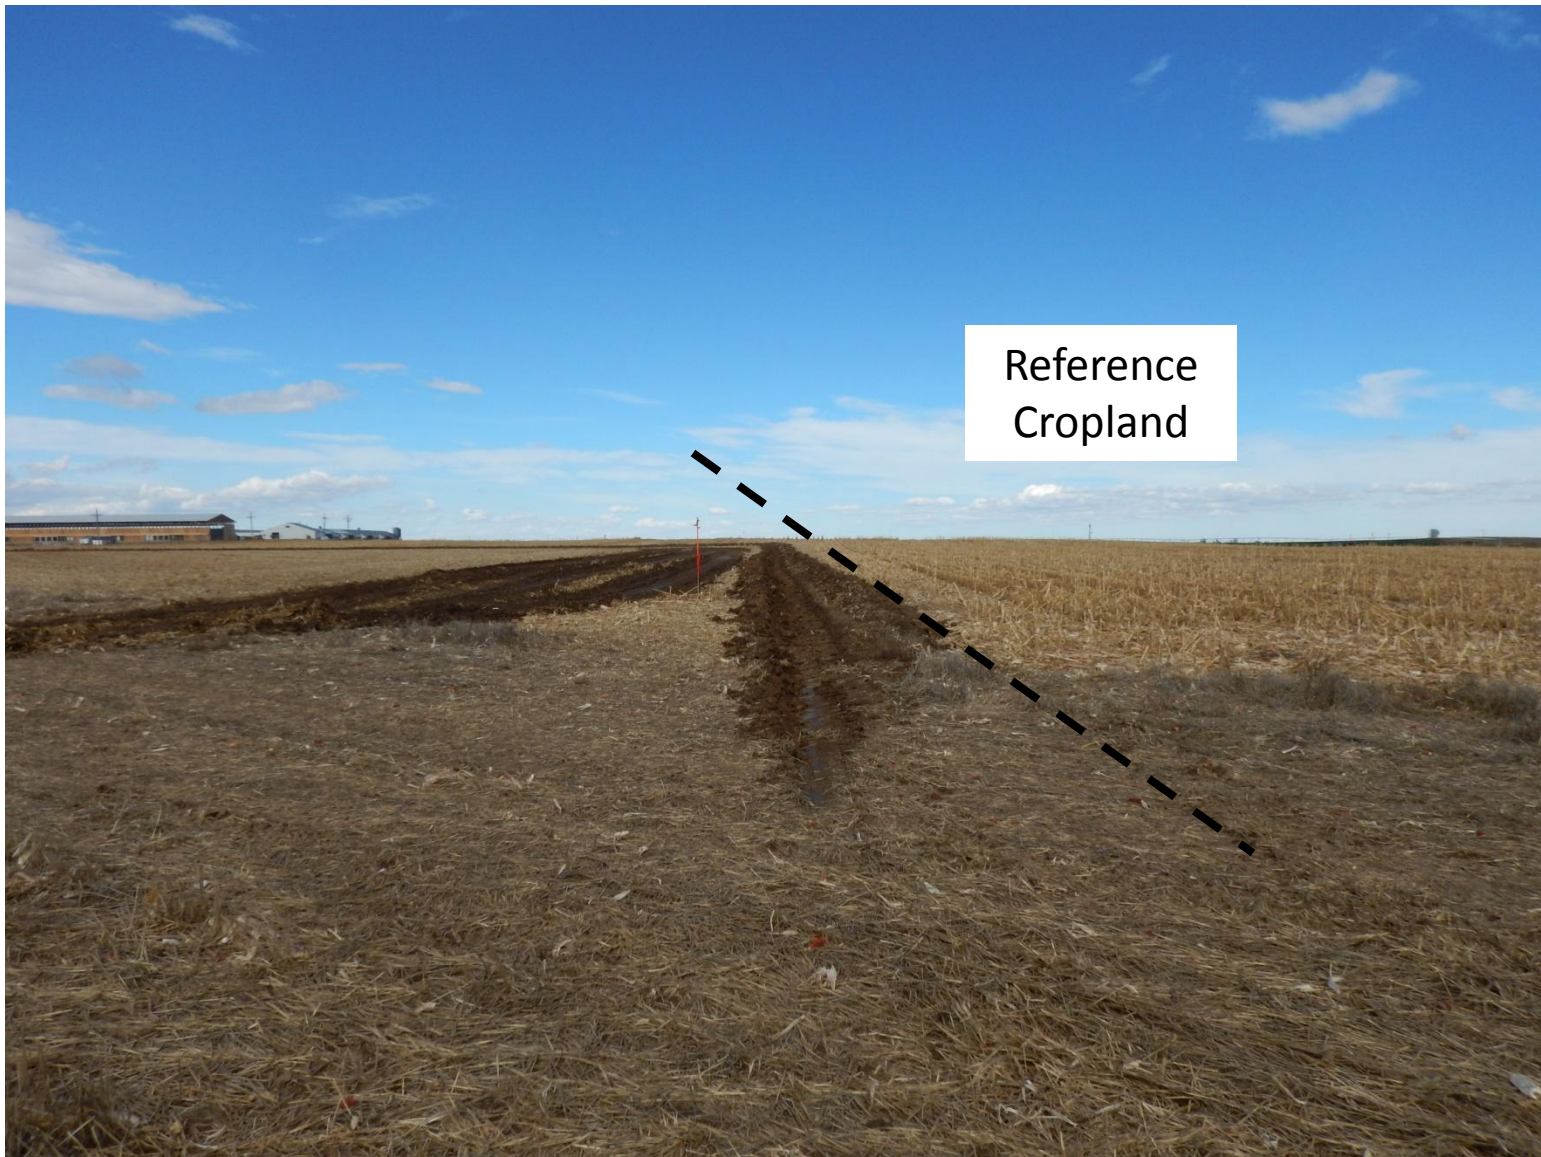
Photo taken from East side of location looking North. Stormwater control ditch center. Reference cropland on right of photo.
